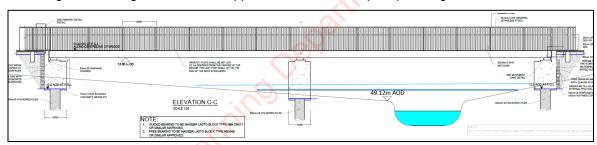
Pedestrian and cycle Bridge 3 Location
